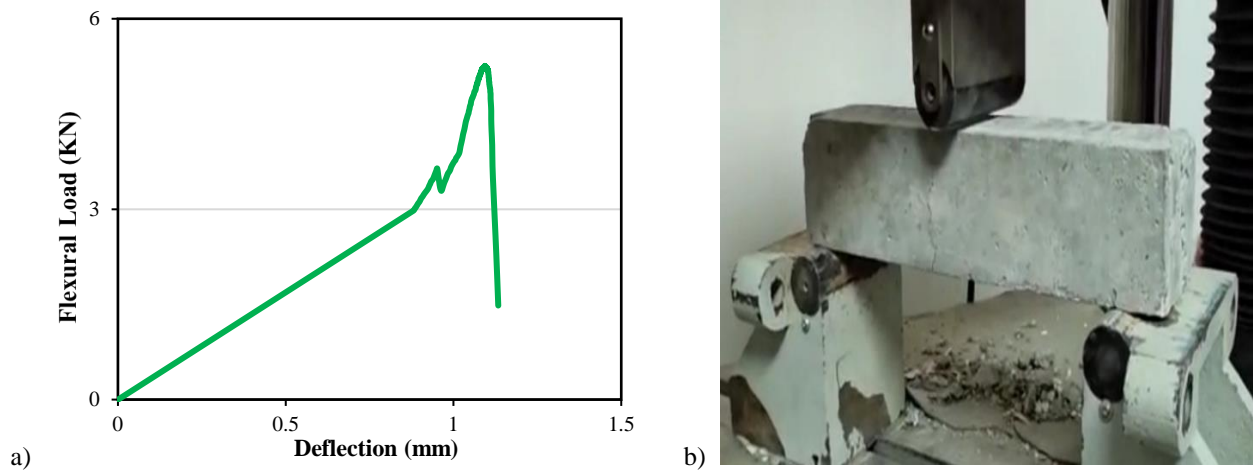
a) Load-deflection curve of plain concrete under flexural loading showing brittle failure behavior, b) Experimental setup and failure mode of plain concrete beam during flexural strength testing.
